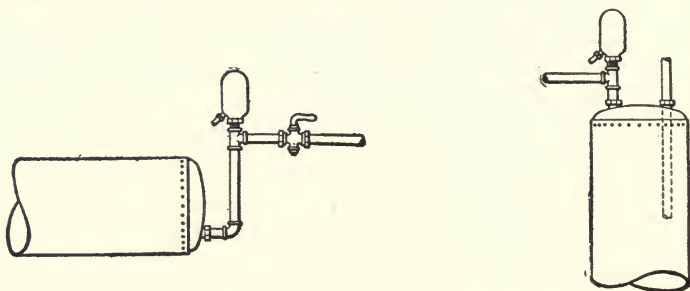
Methods of Fitting Combined Vacuum and Safety Valve to Horizontal and Vertical Boilers.
